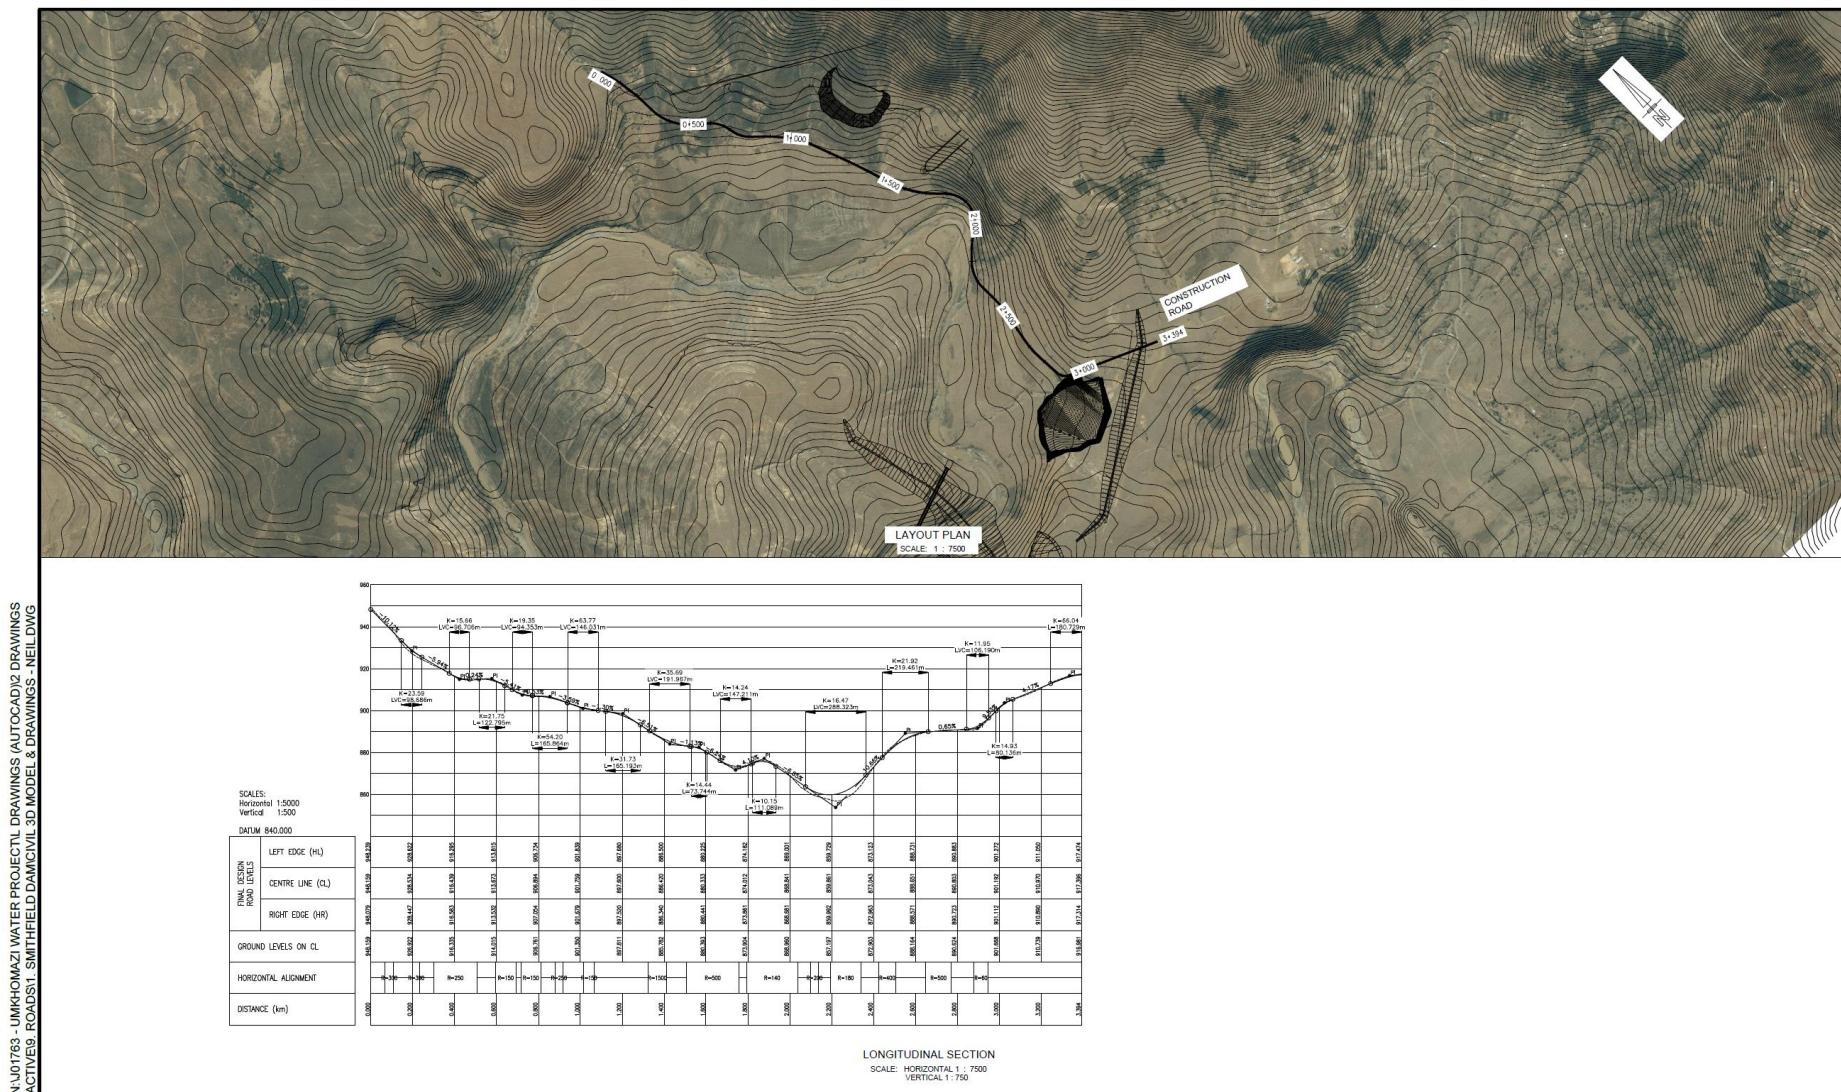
C.7: Smithfield Dam – Layout plan and longitudinal section of construction road
